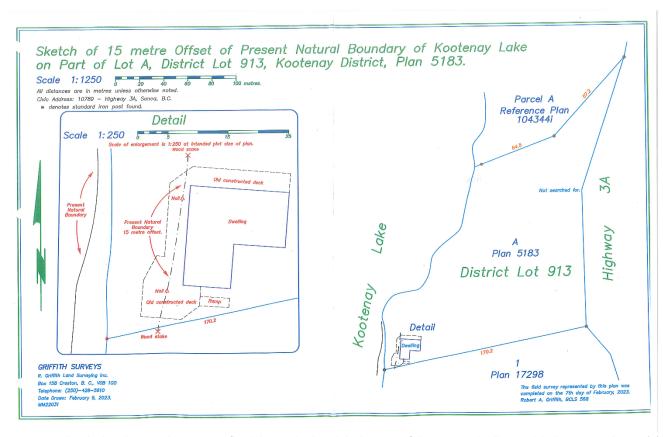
Sketch Plan showing the 15 metre floodplain setback and the location of the existing dwelling and deck. See Attachment 'B' for a full size version of this sketch plan.
